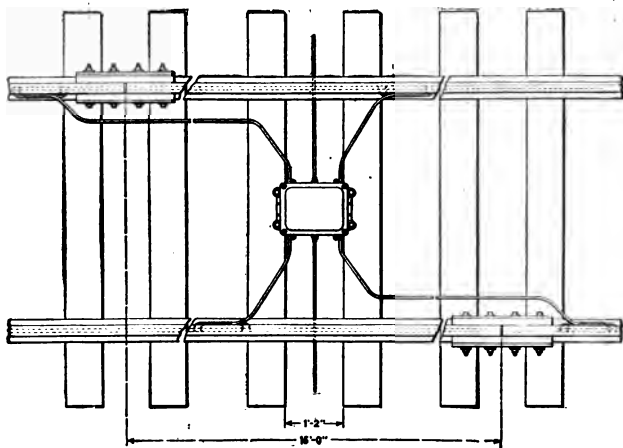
Layout for Double Bond Shown in Fig. 98. The Rail Cables are Soldered at Their Bond Ends Into Eye Connectors Bolted to the Bond Terminals; the Rail Ends of the Cables are Soldered to U-shaped Connector, Fastened at Each End to the Rail by Channel Pins.
